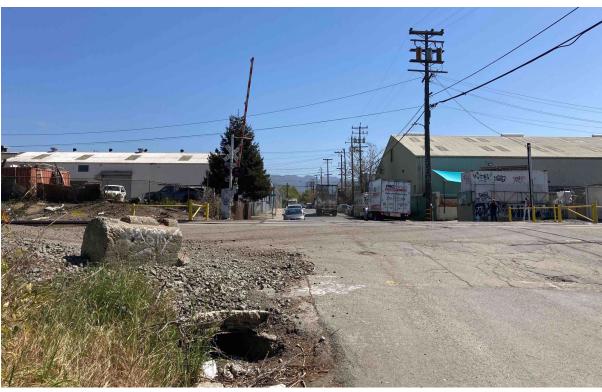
View of the railroad crossing at Addison Street, facing northwest.
